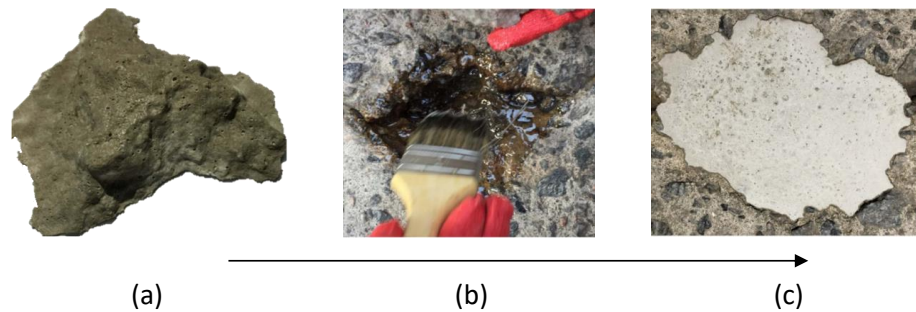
Spall damage repair using 3D printed concrete: (a) concrete patch produced for the experiment, (b) applying adhesive to the concrete patch, and (c) concrete patch seated in the damaged area [269].
